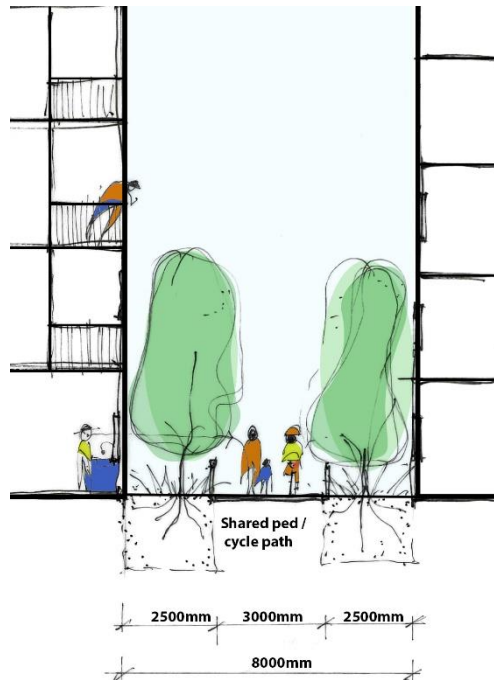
Cross-section of an 8-metre wide shared ped / cycle connection including a 3-metre wide shared path and 2.5-metre wide landscape areas for shrub and tree planting either side.
